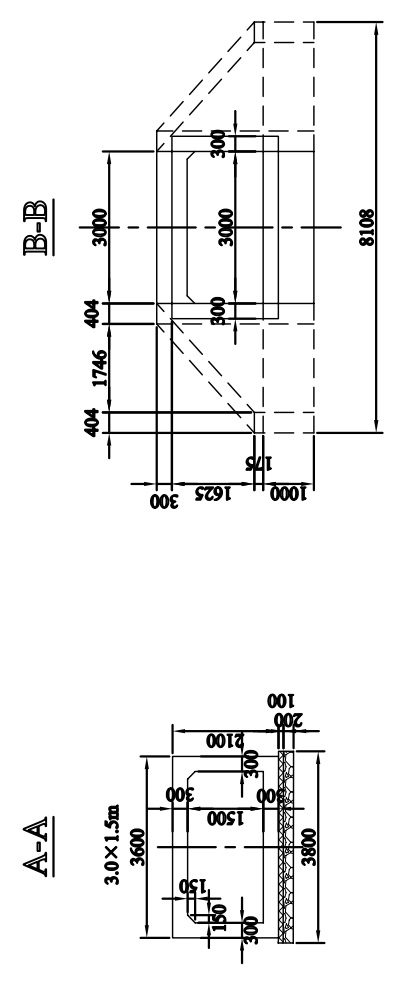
General View of Box Culvert(BC1 Sta.305+530)
